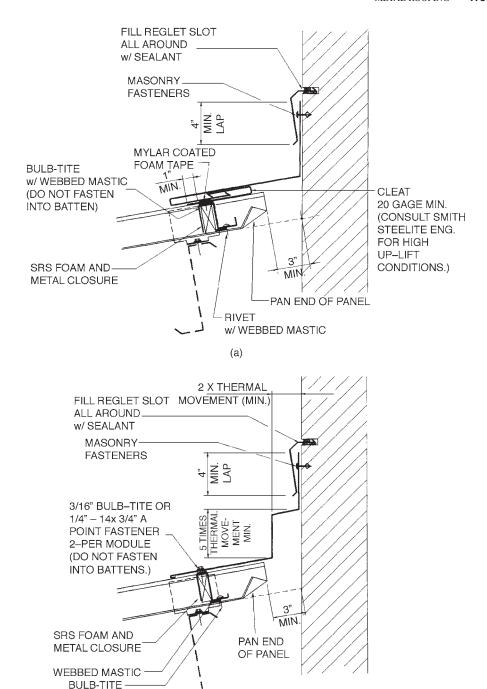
Section through parapet at high-side wall. (A&S Building Systems.)
